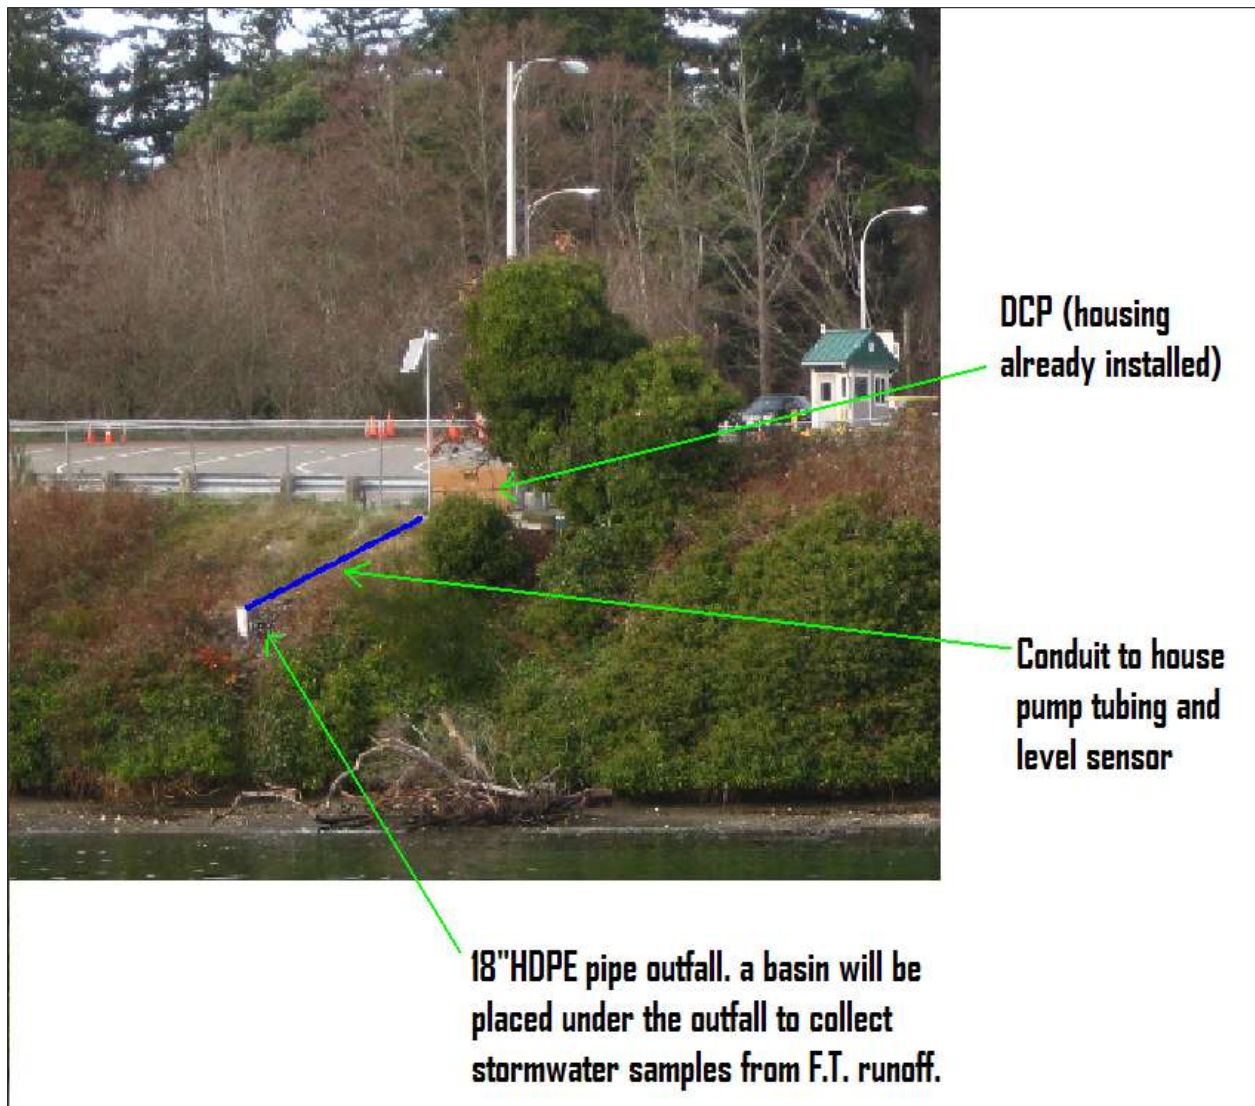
Bainbridge Island Ferry Terminal monitoring station and conduit.
